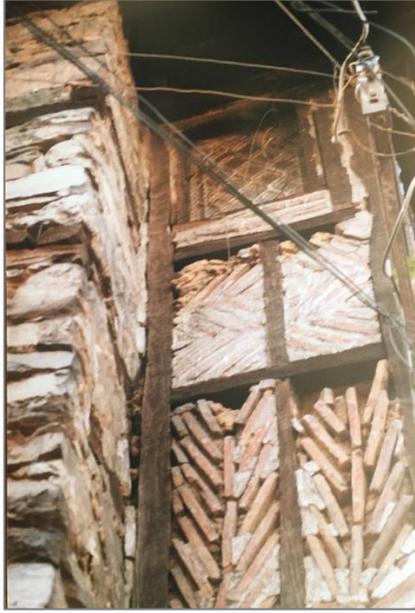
Brick decoration & infill in timber frame construction -lot no: 2794-42 (Source: above left: Neriman Şahin Güçhan Archive,1998, above right: Piray Architecture Archive, 2008)
